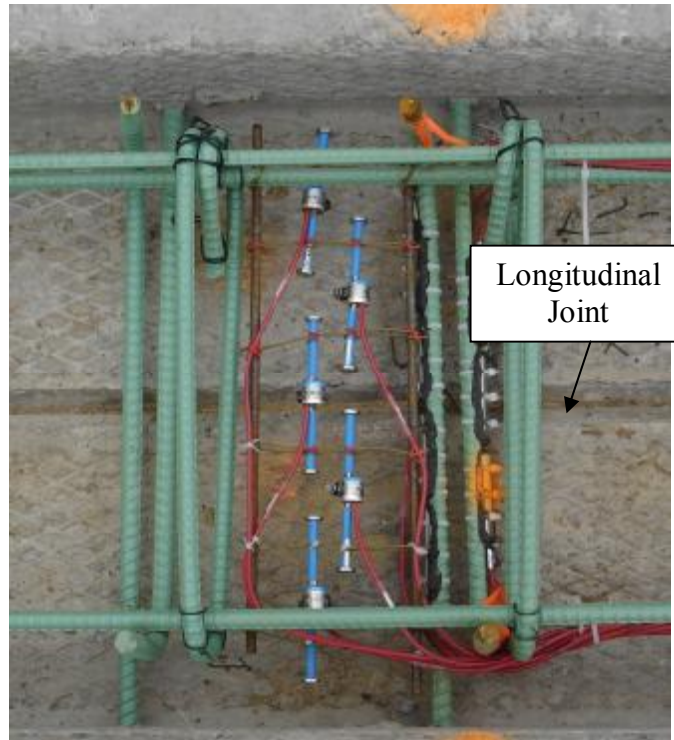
Photograph of VW embedment strain gages installed above precast longitudinal joints
